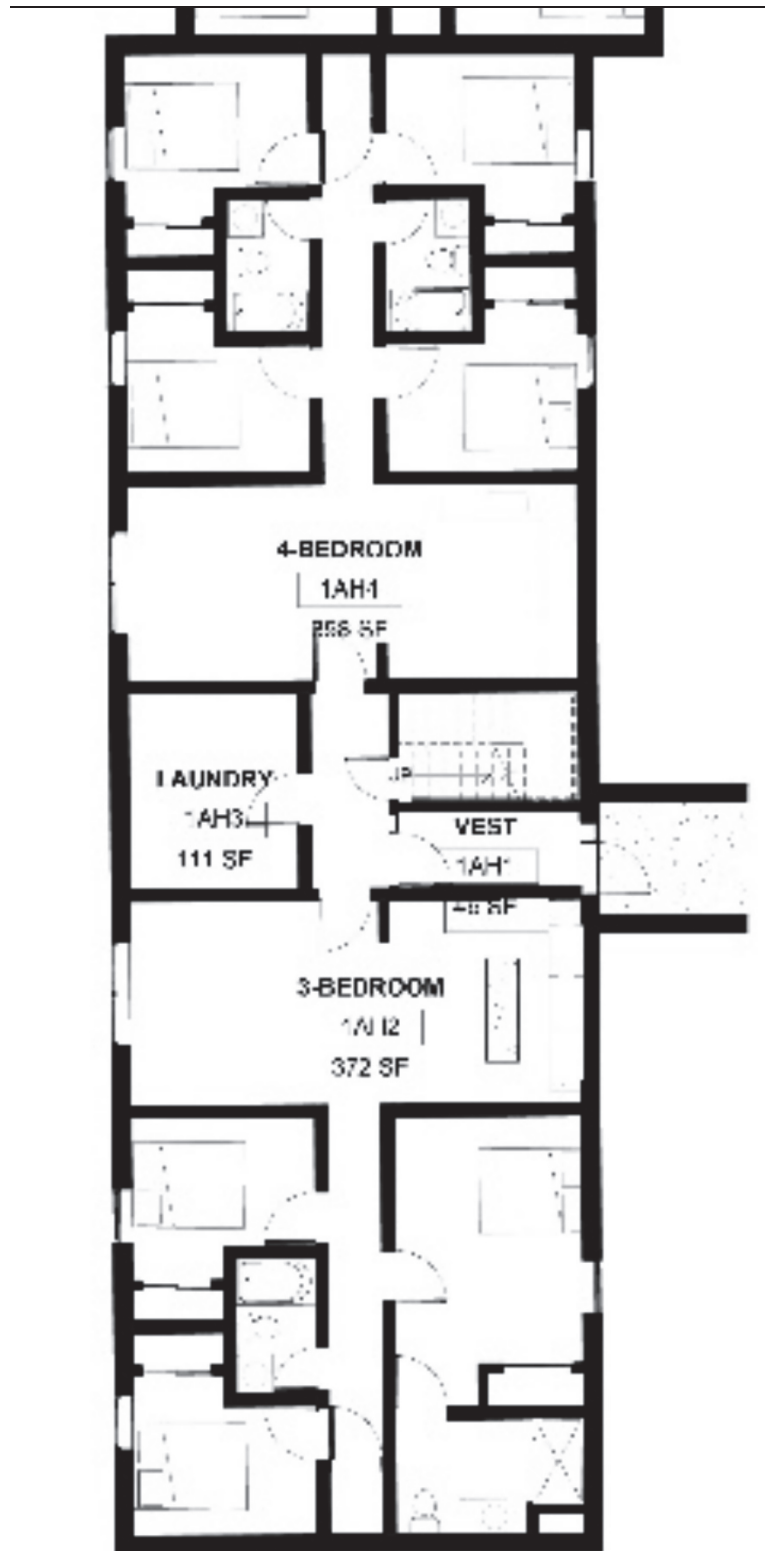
Affordable Housing Apartment Units Level 1 Floor Plan
